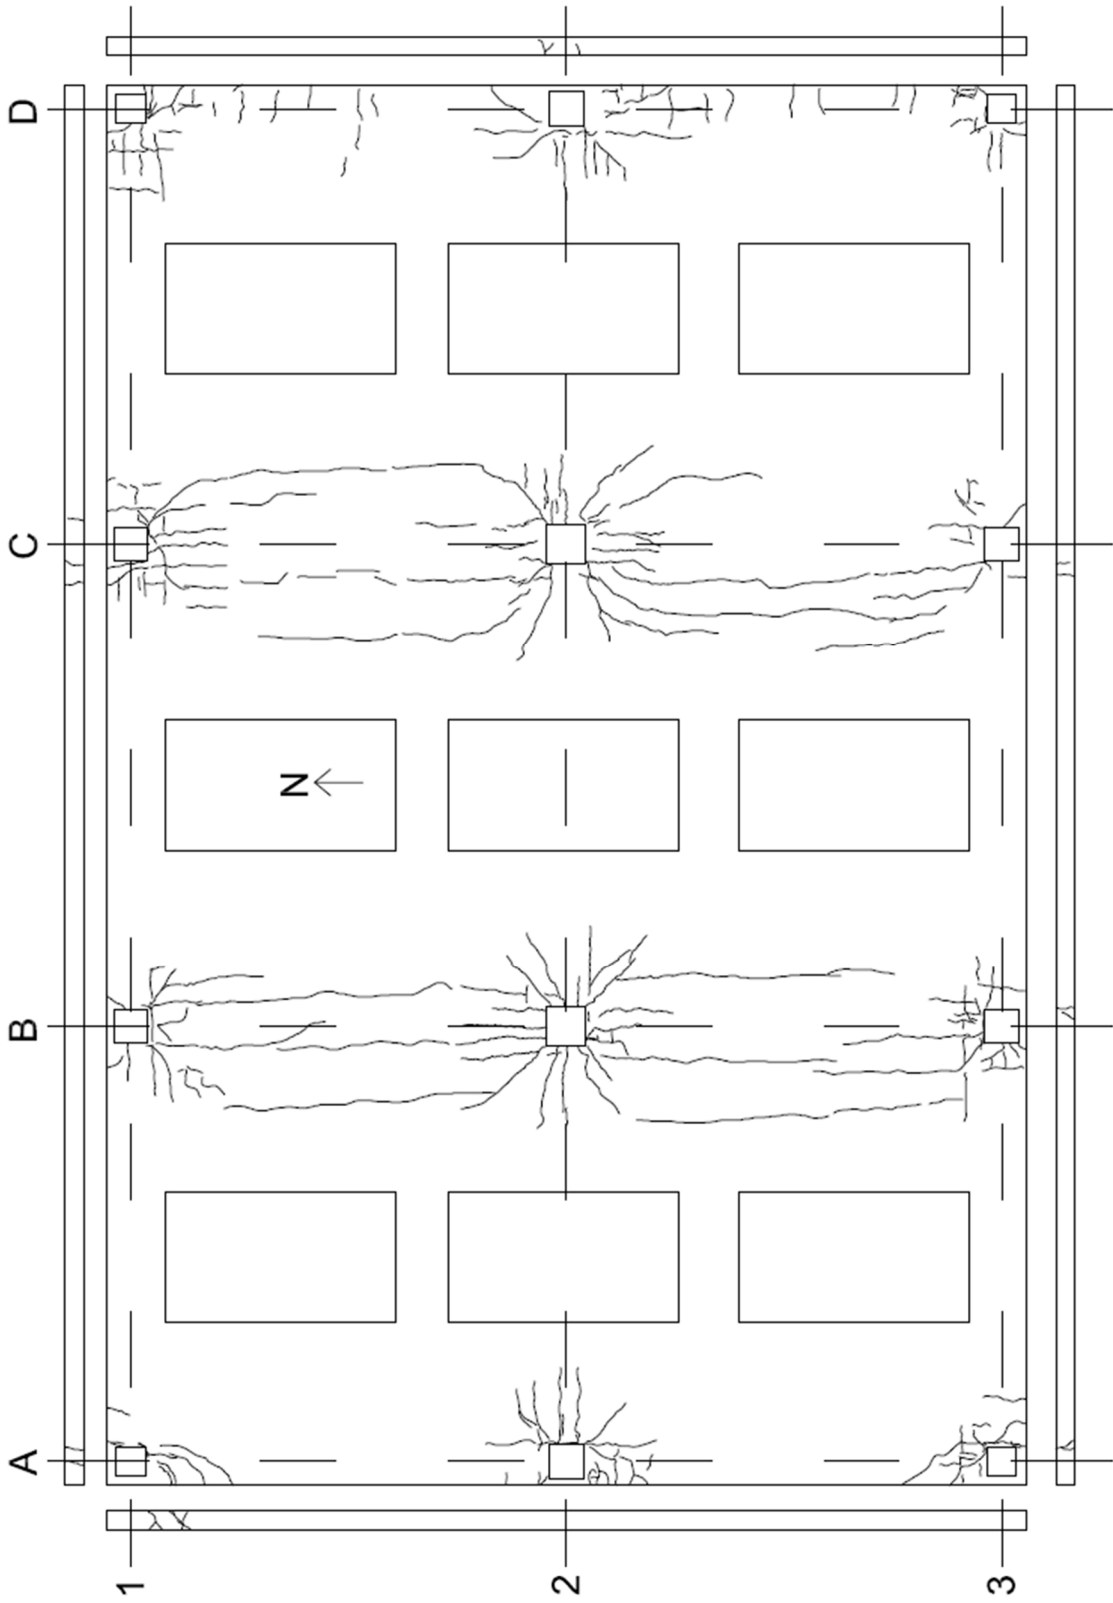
Crack pattern extrados 2nd floor Test Cyc-1 (f02).
